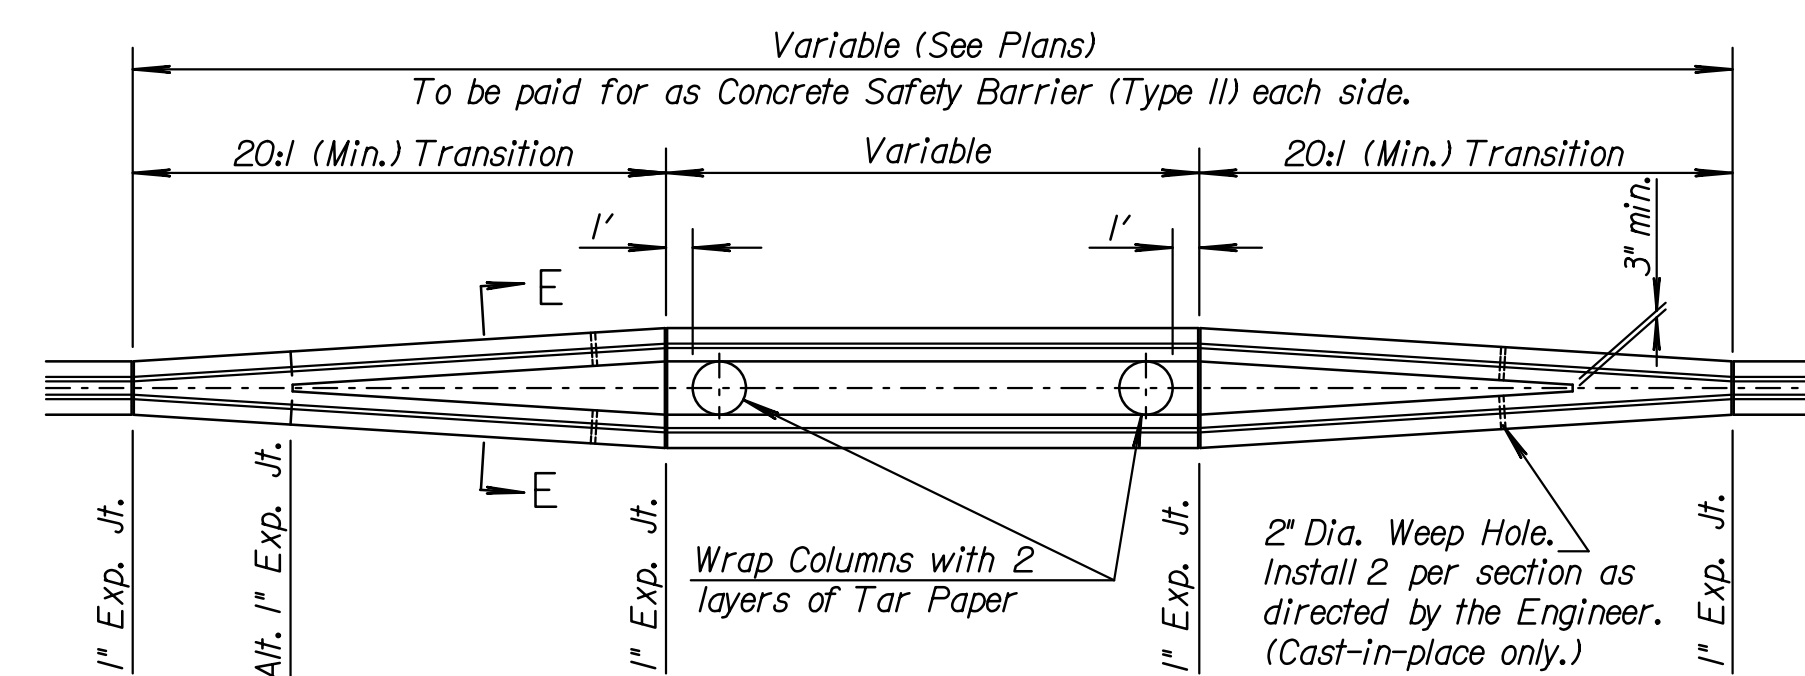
DETAIL FOR BRIDGE WITH SAFETY TYPE RAIL
